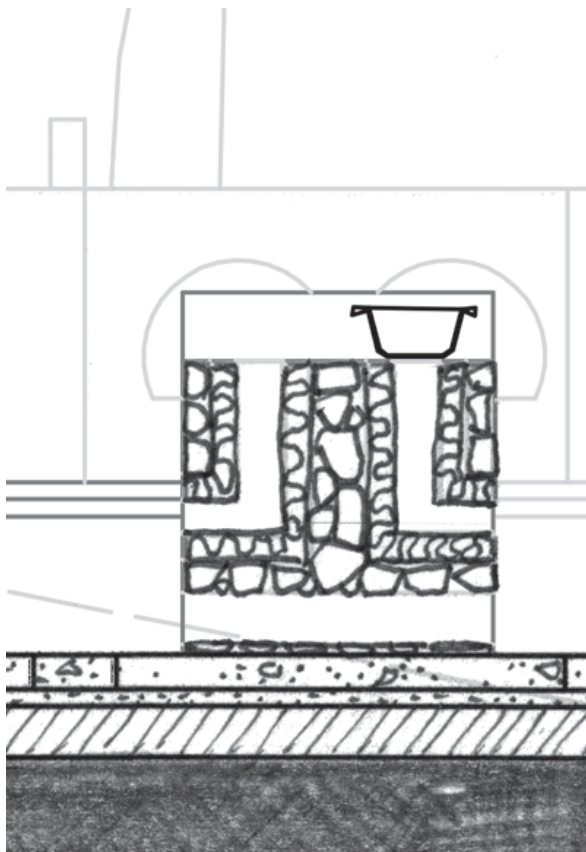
Work bench section through rocket stove installation (not to scale) (Author 2015)
